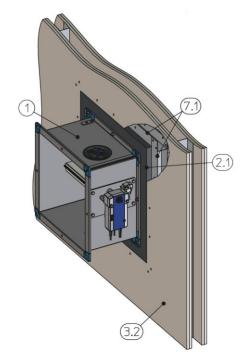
Mortar-based installation into a lightweight partition wall, below a flexible ceiling joint
